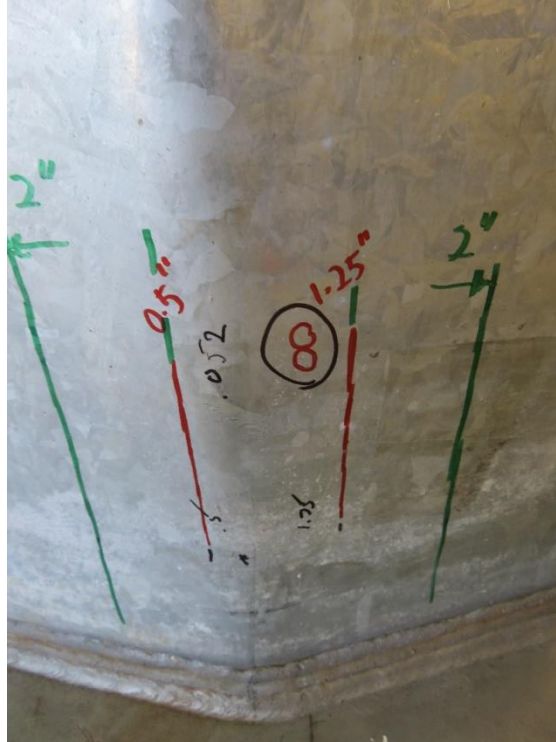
State of Cracks: Specimen 33-3-12-TX-A2 – Bend 8
